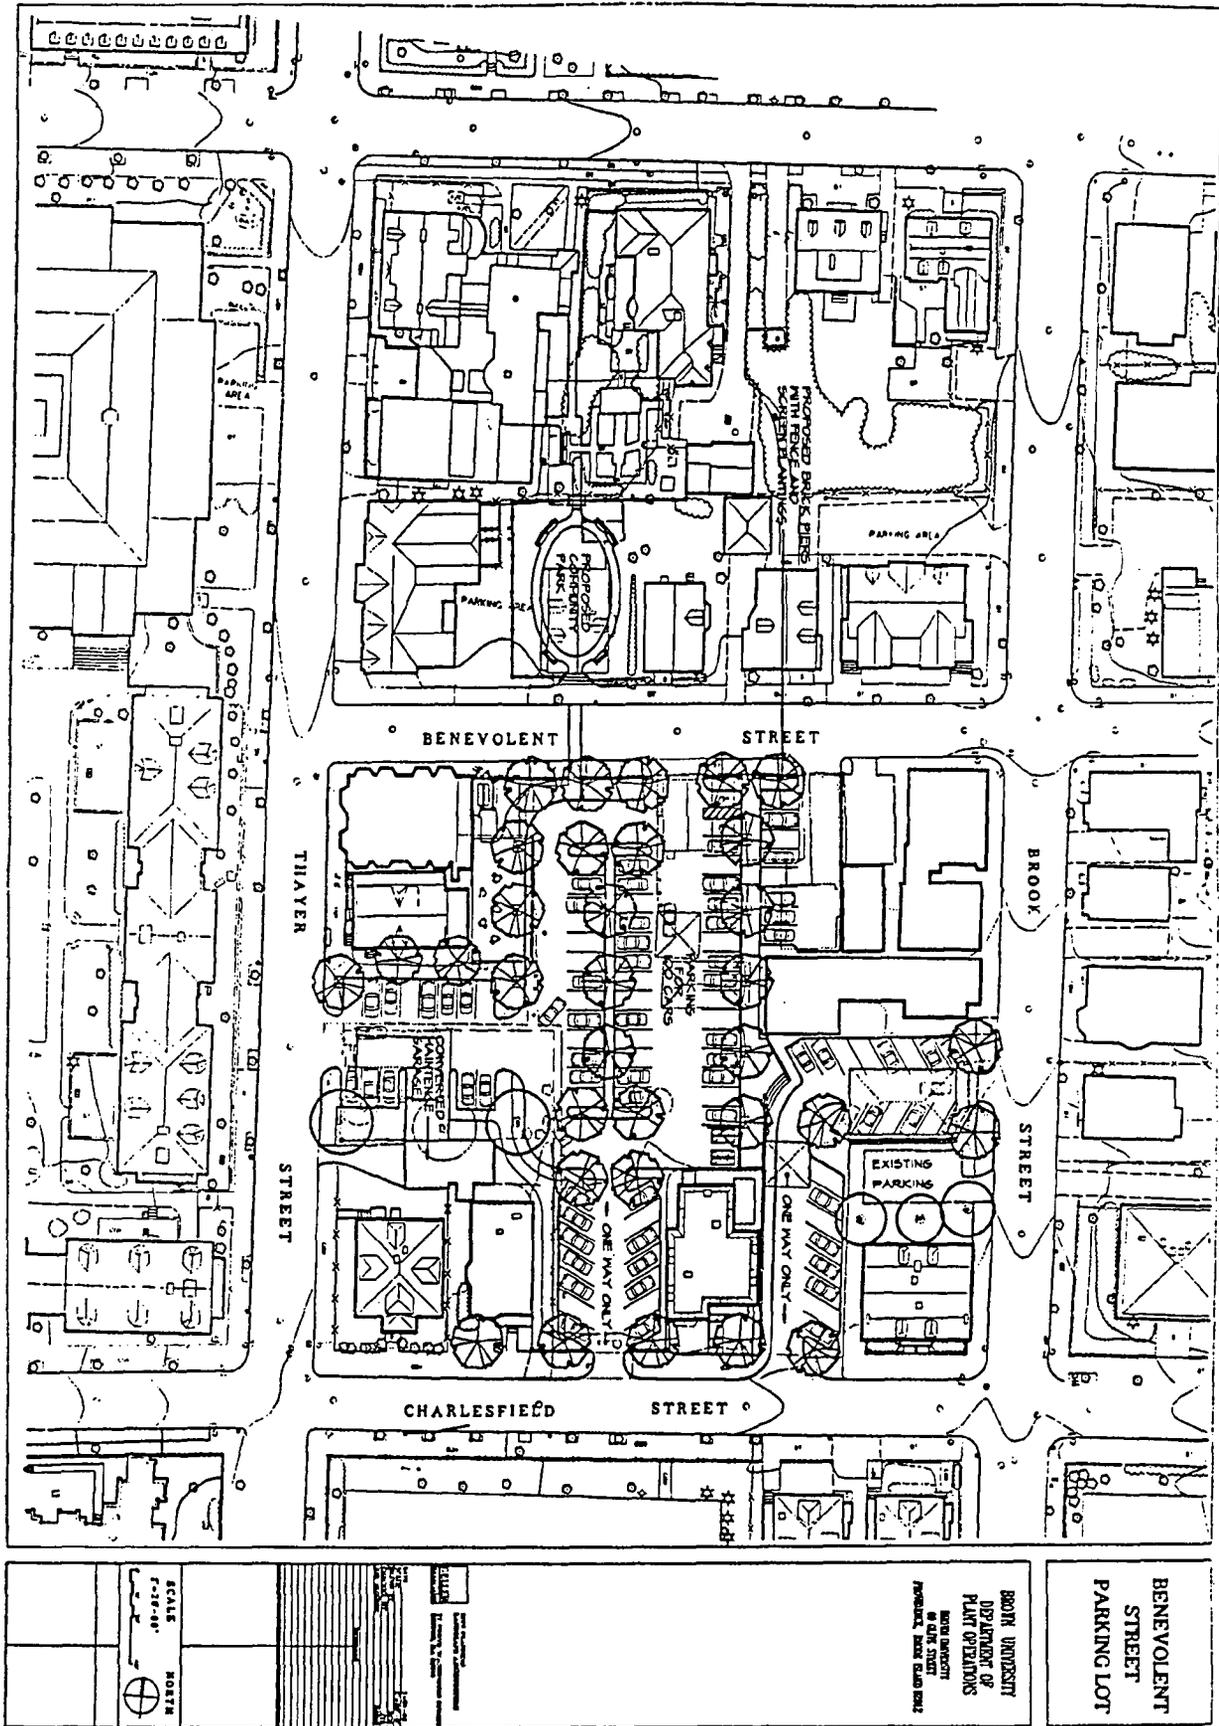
Conceptual Site Plan for Improvements to Landscaping and Parking Lot at Benevolent Street
